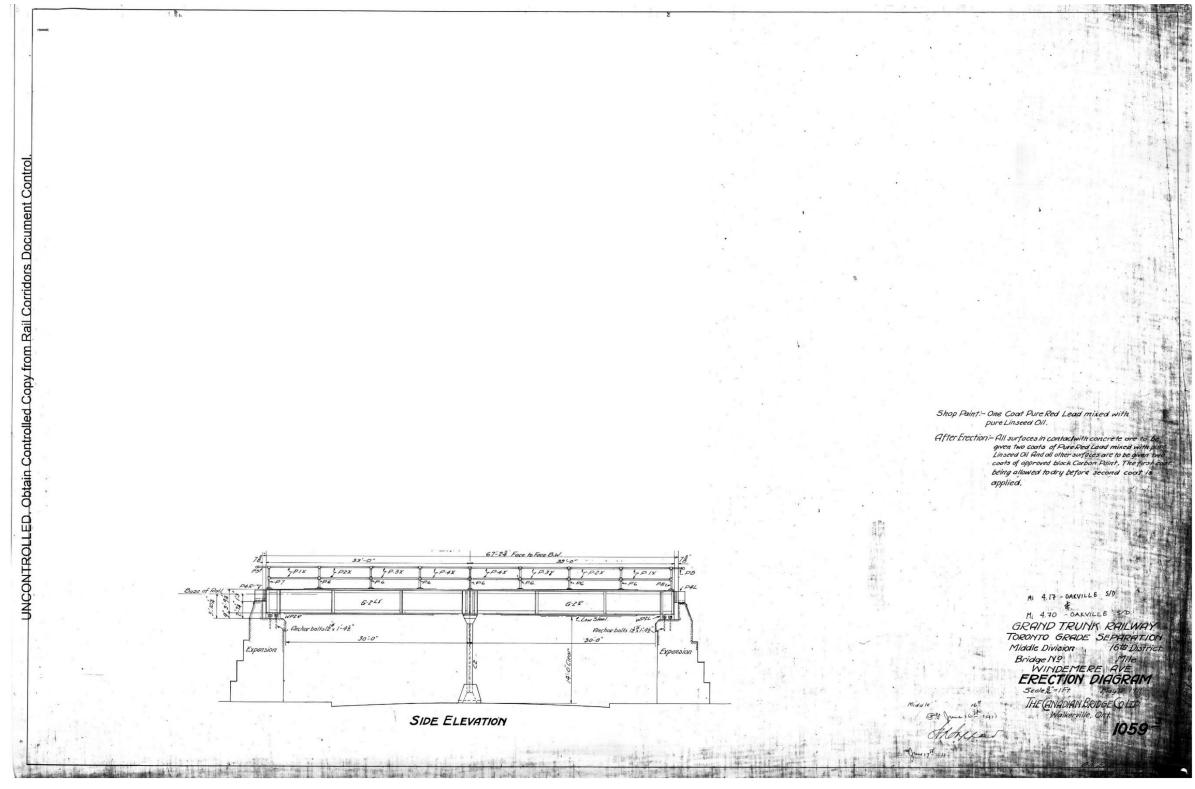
Erection diagram for the Windermere Avenue Bridge (Mile 4.70) (Grand Trunk Railway 1911c)
